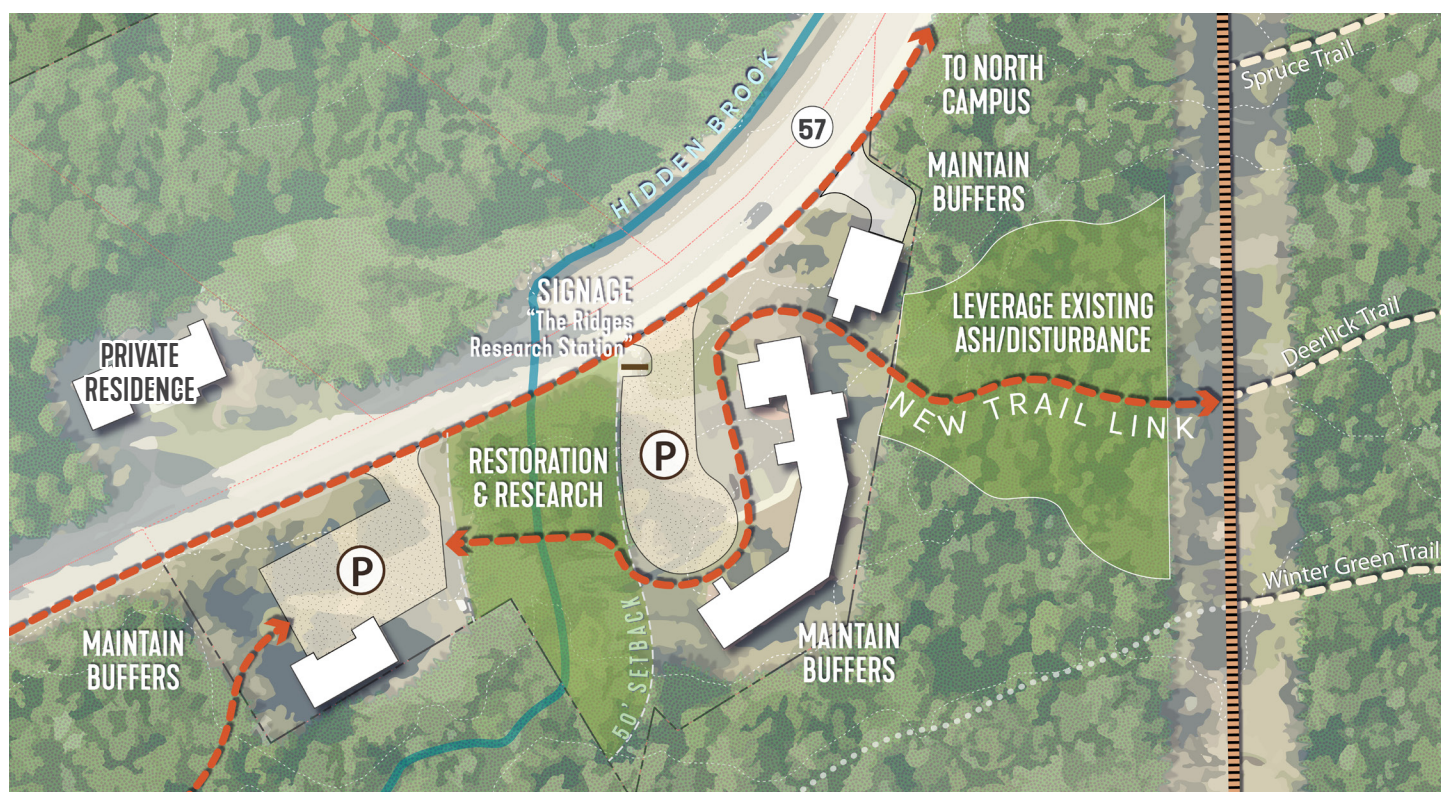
Proposed site plan for the Research Campus at the renovated Ridges Inn property.
